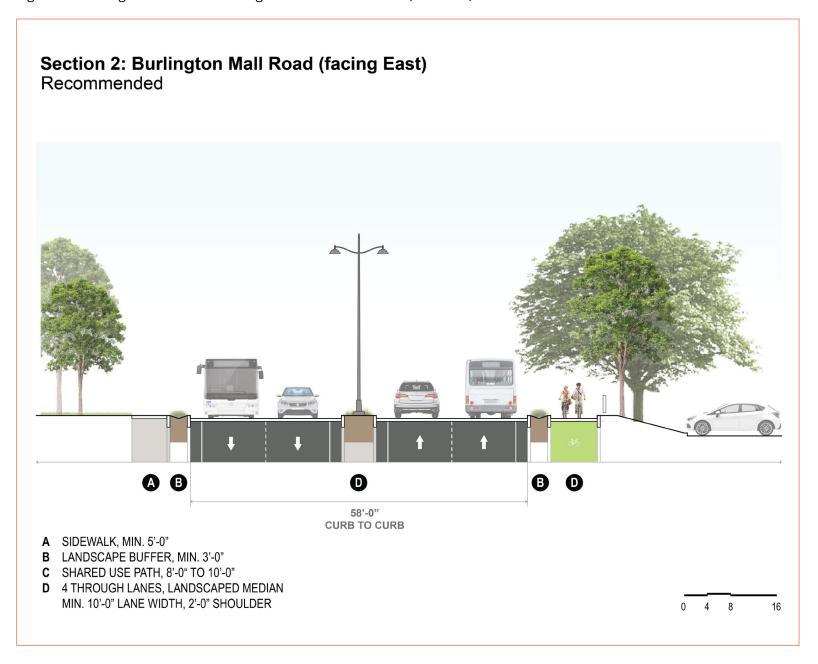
Burlington Mall Road Existing and Future Conditions (Section 2)
